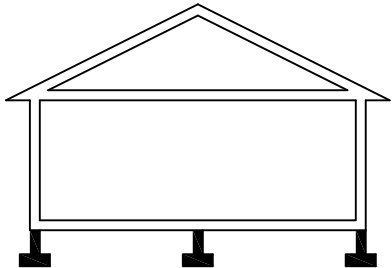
ROOF, CEILING AND ONE CENTER-BEARING FLOOR
